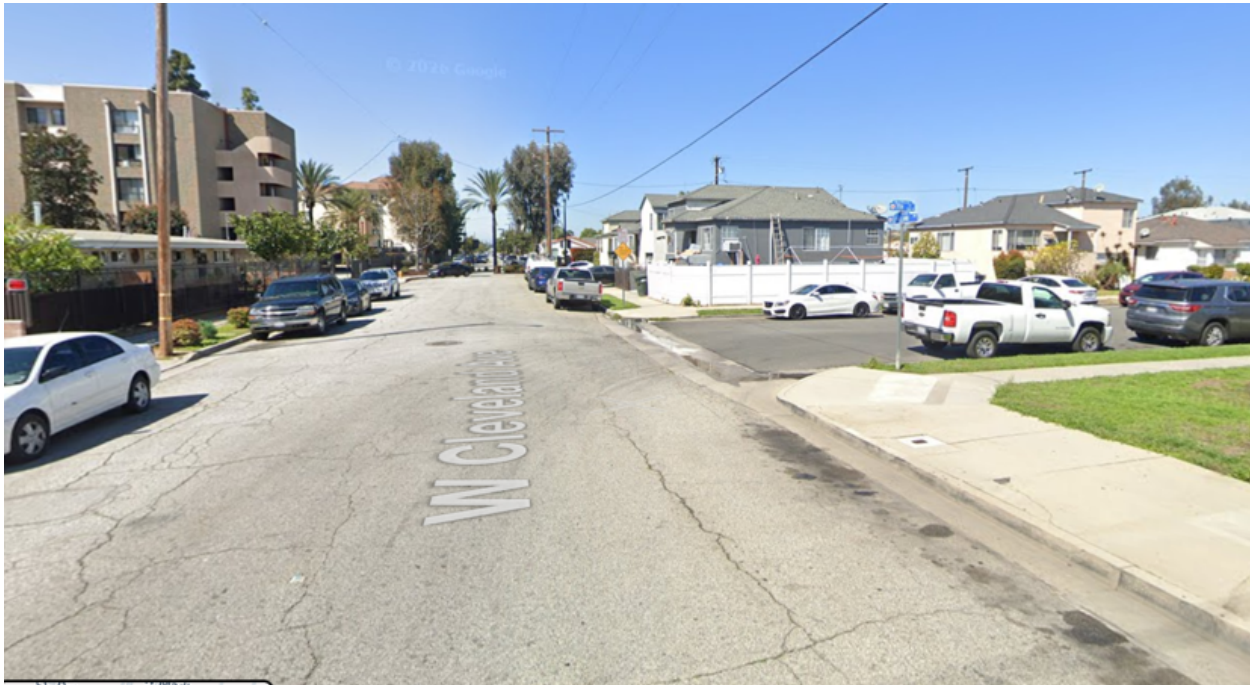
Street View of Cleveland Avenue Looking East at N. 7<sup>th</sup> Street
